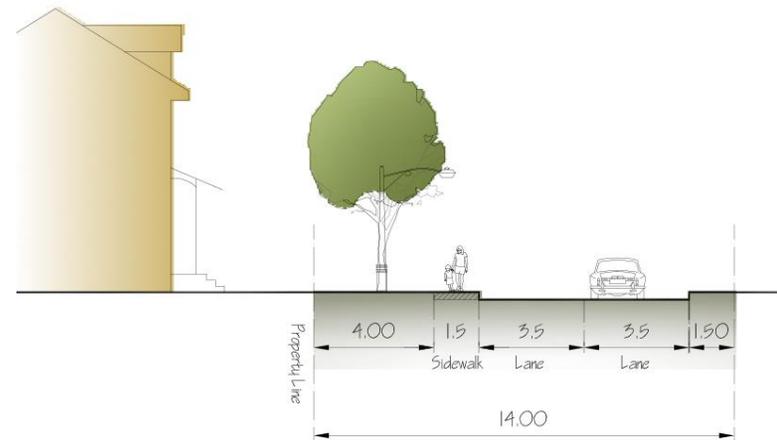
Single Loaded Road Cross Section (14.0m)
